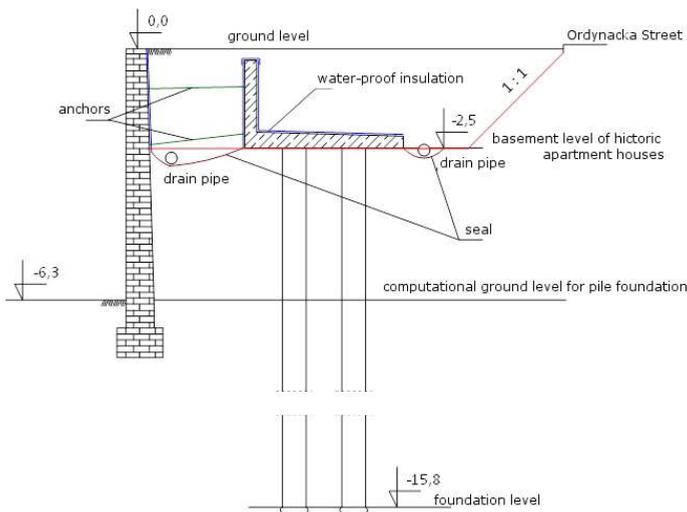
Design solution for increasing retaining wall stability and reinforcement at Ordyncka St. [6].
